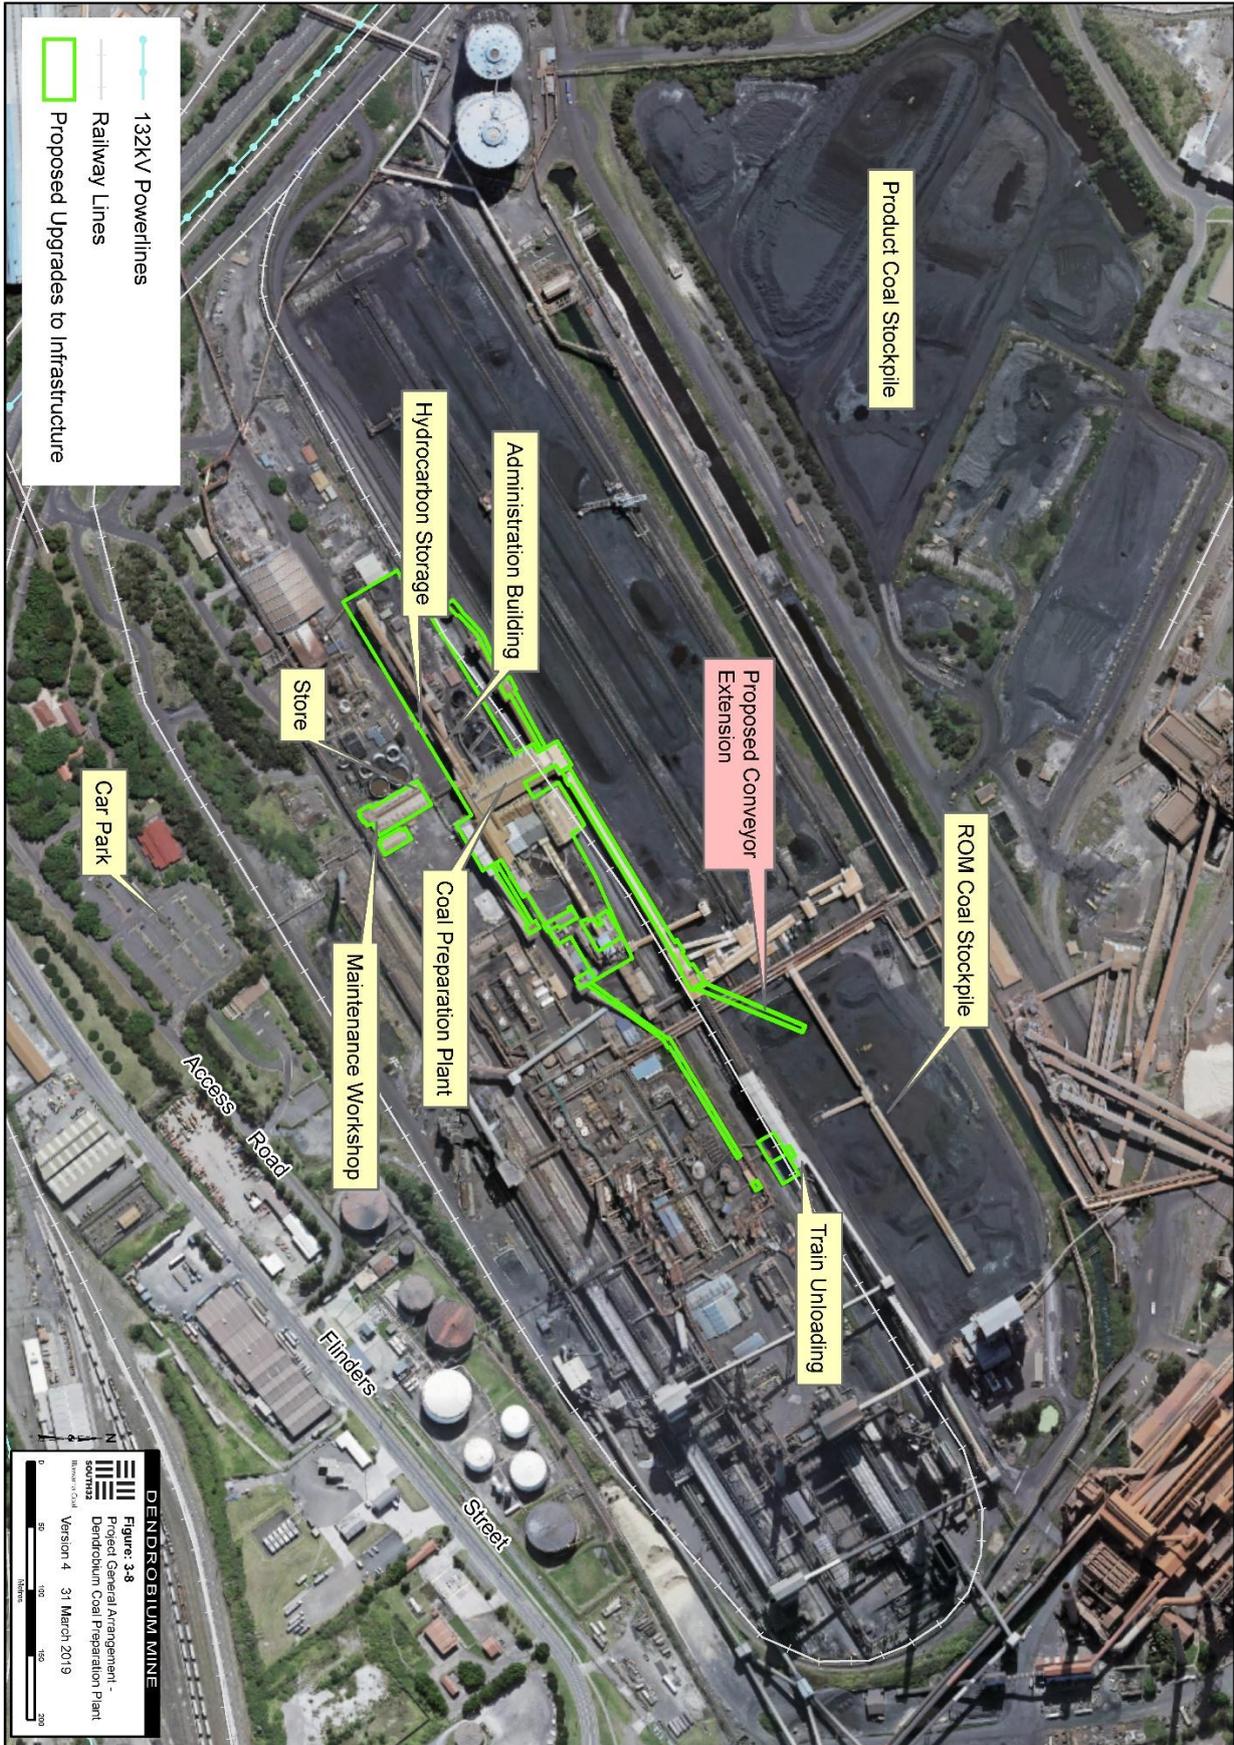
General Project Arrangement – Dendrobium Coal Preparation Plant
